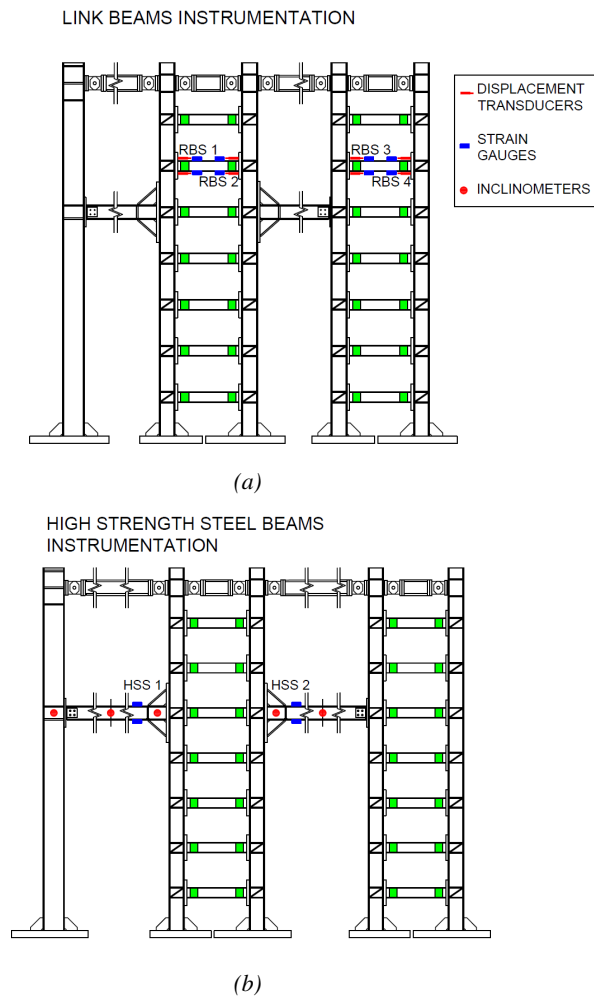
DRLF-HSS: Configuration of instrumentation system on (a) link beams and (b) HSS beam.
